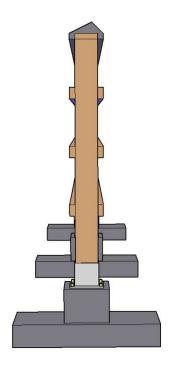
3D drawing of Hempcrete noise barrier wall. Side view.
